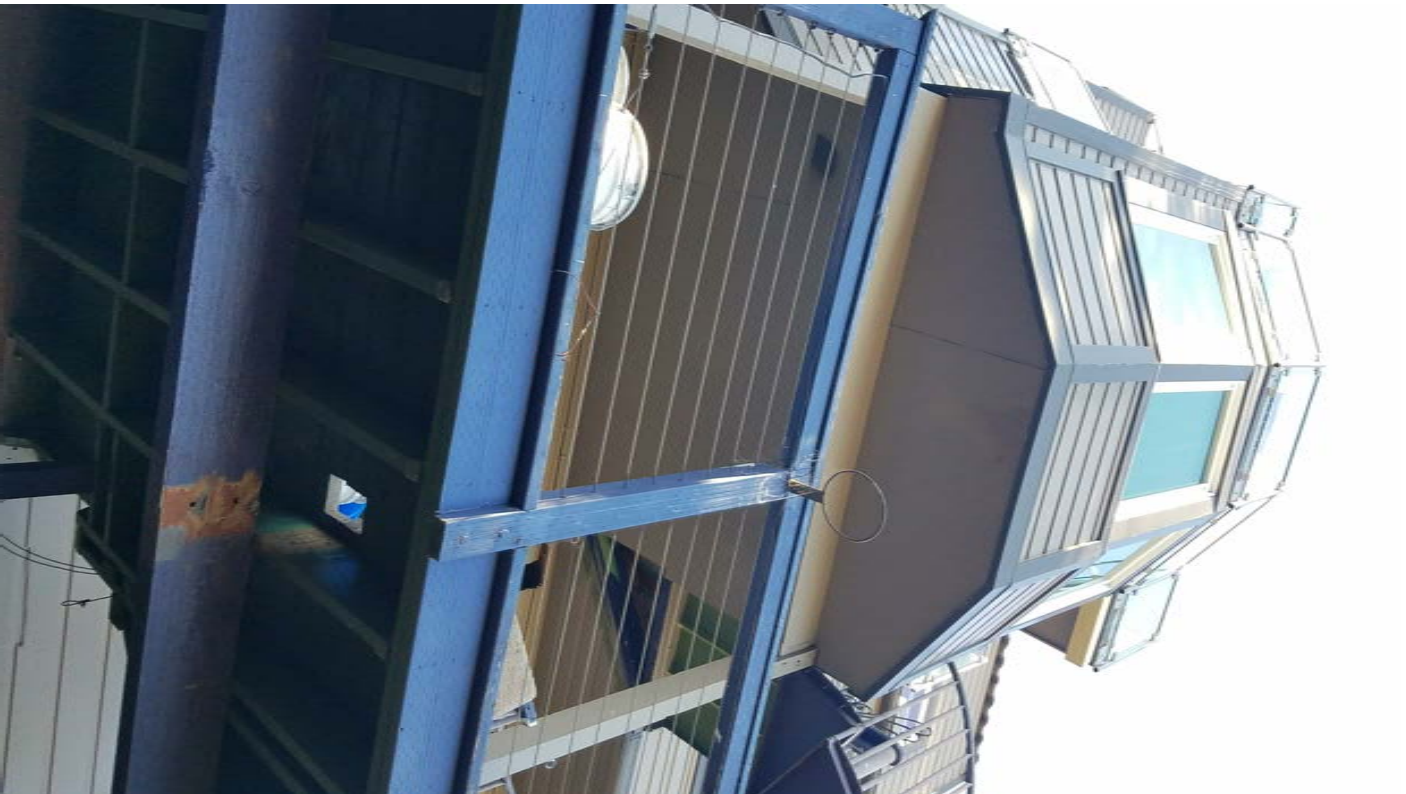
PHOTO OF REAR BREAKFAST NOOK - PROTRUSION
